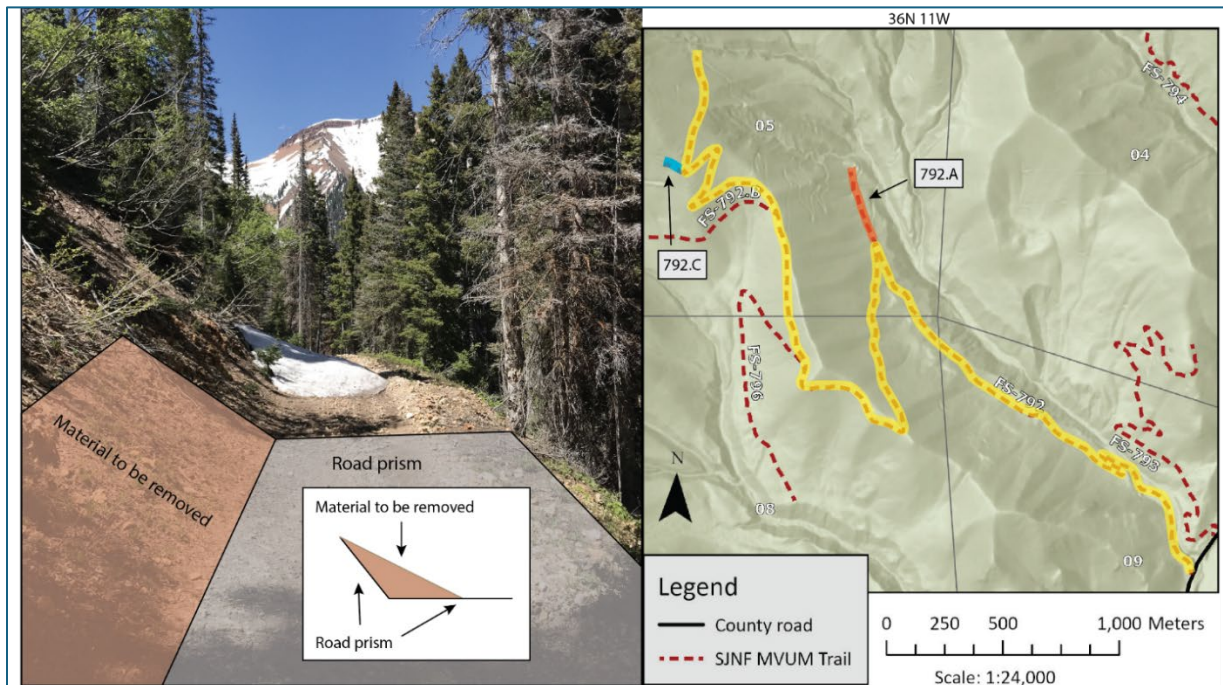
Road/trail prism re-establishment is proposed on sections of NFST-792, with the entire length of the listed trails requiring grading (792 highlighted in yellow; 792.A highlighted in orange; and 792.C highlighted in blue). These trail sections are proposed to be maintained for a period of 12 months, temporally correlative with exploration activities.
